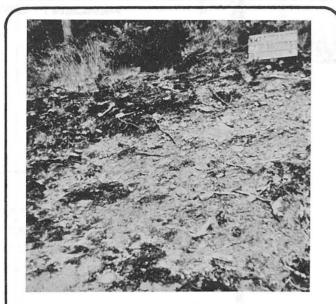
Slight sheet erosion on ROW, in summer of 1975 (Photo Station 6).
